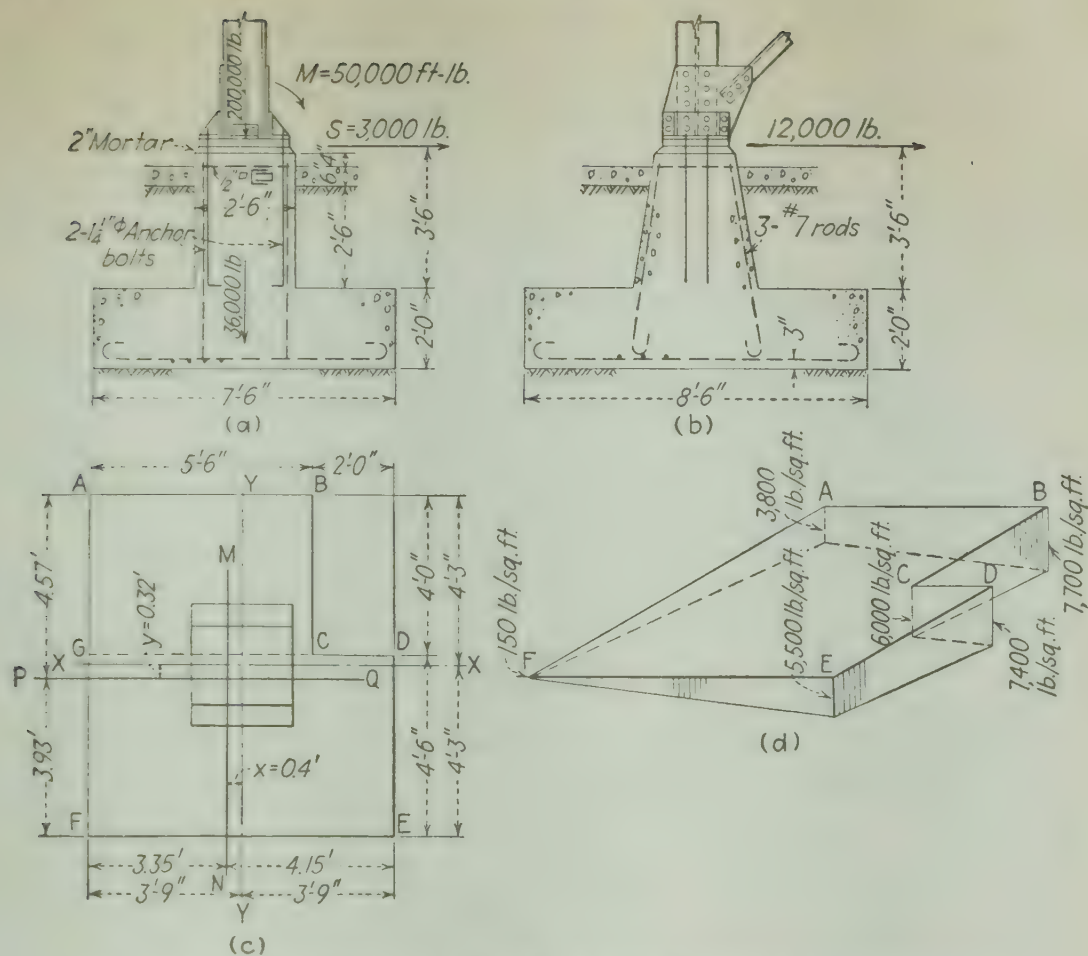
Unsymmetrical footing for steel column in industrial plant.
